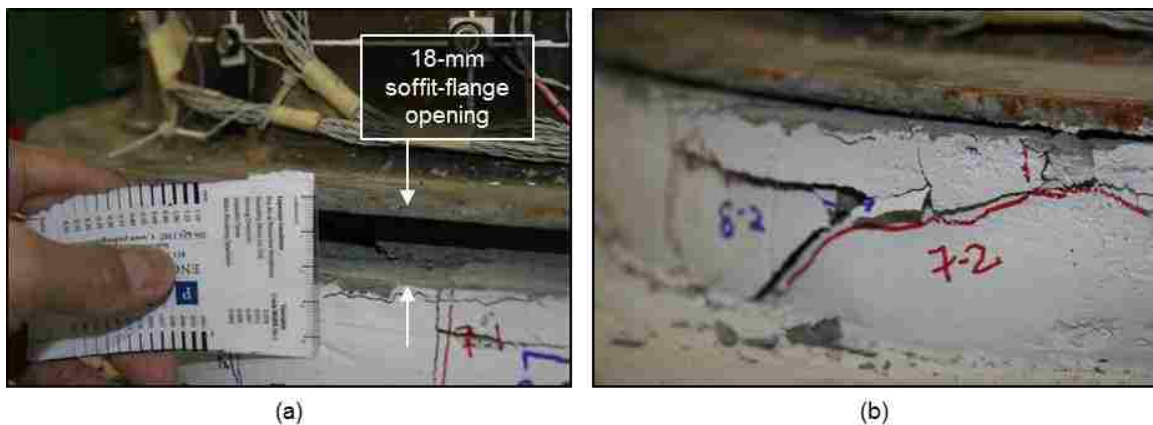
WRCUB North (a) soffit-flange opening, and (b) cap beam crack widths at 2.24% drift South
